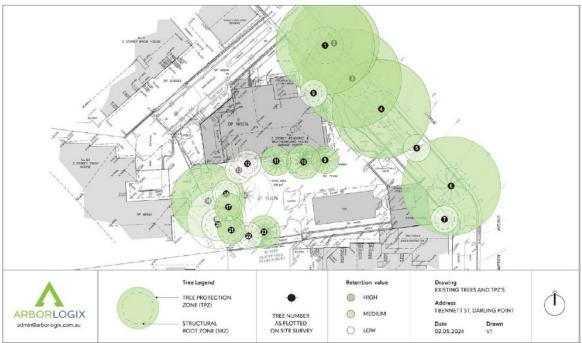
Arborist plan submitted with the proposal Source: Arborlogix
